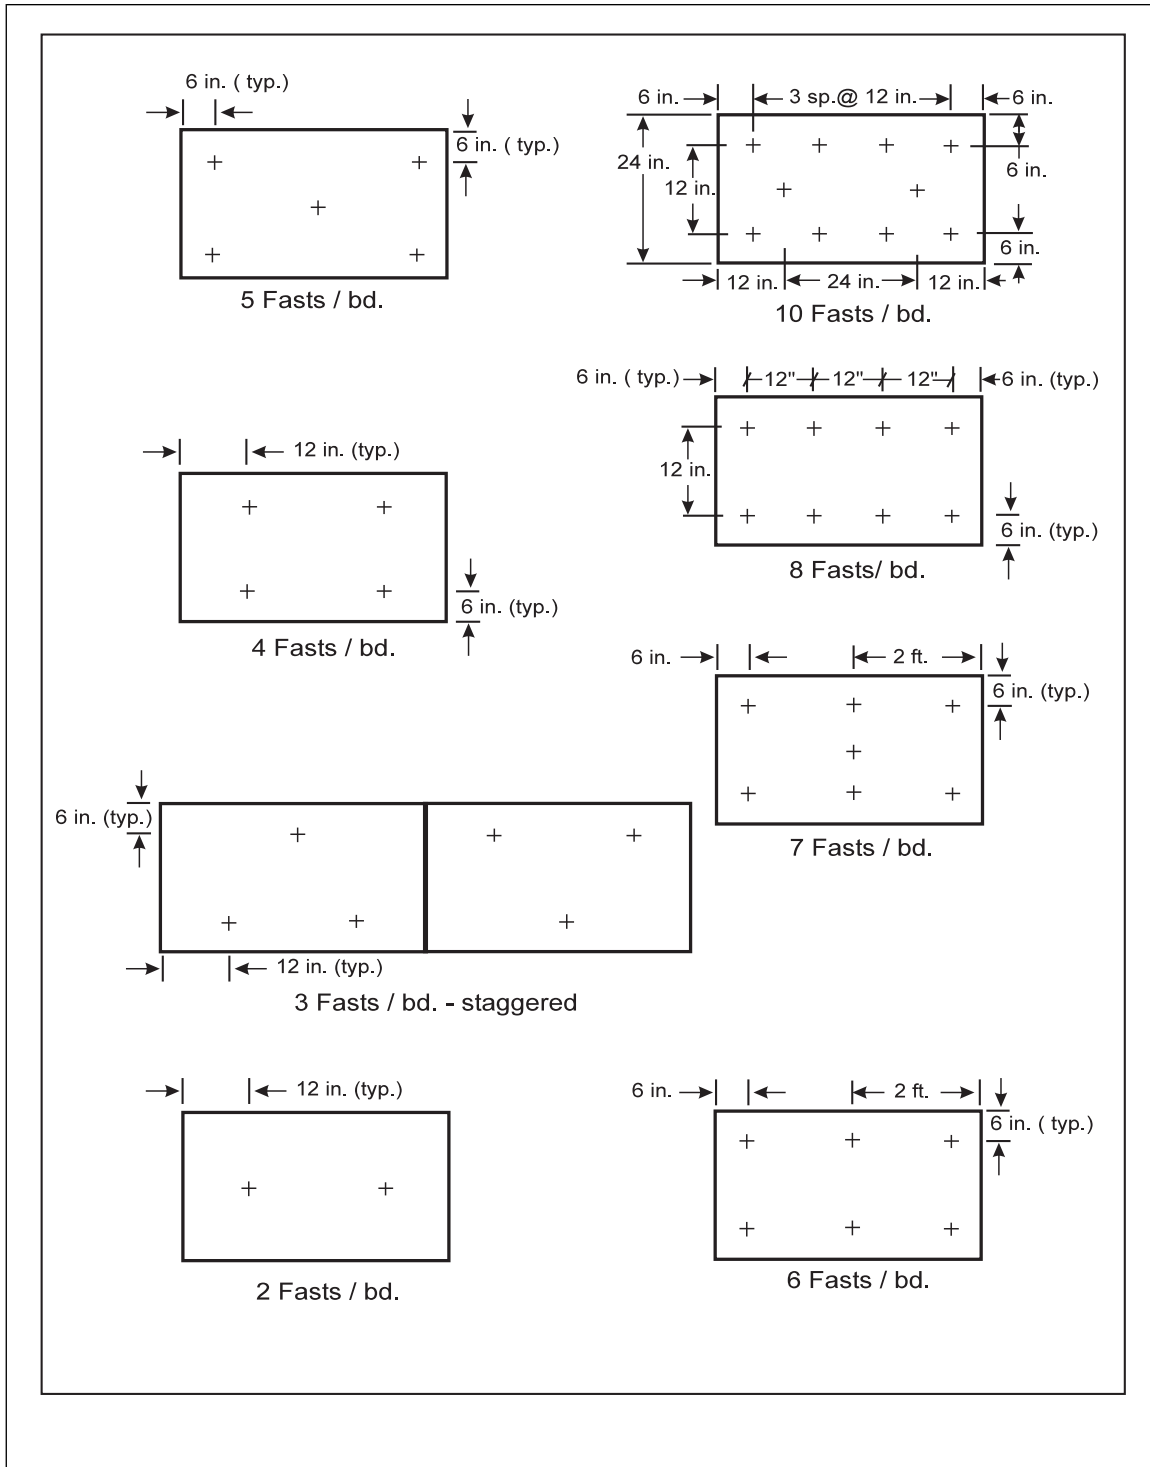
Fastener placement 2 x 4 ft (0.6 x 1.2 m) boards used on steel decks with a 6 in. (150) module or rib spacing
